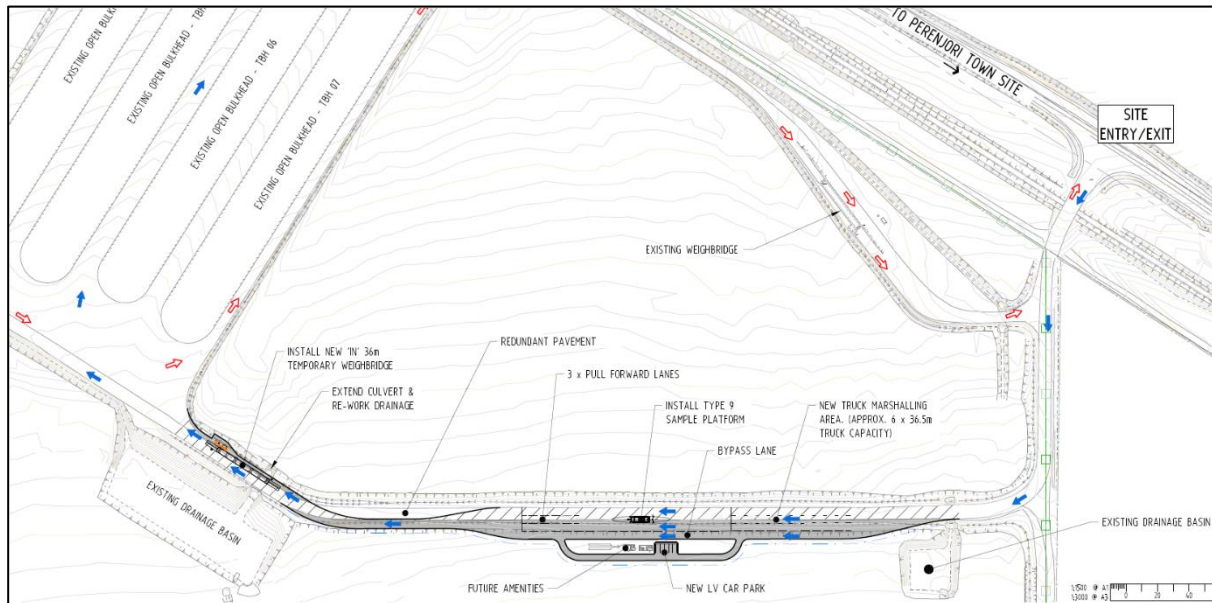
Proposed Weighbridge and Sample Platform site plan
